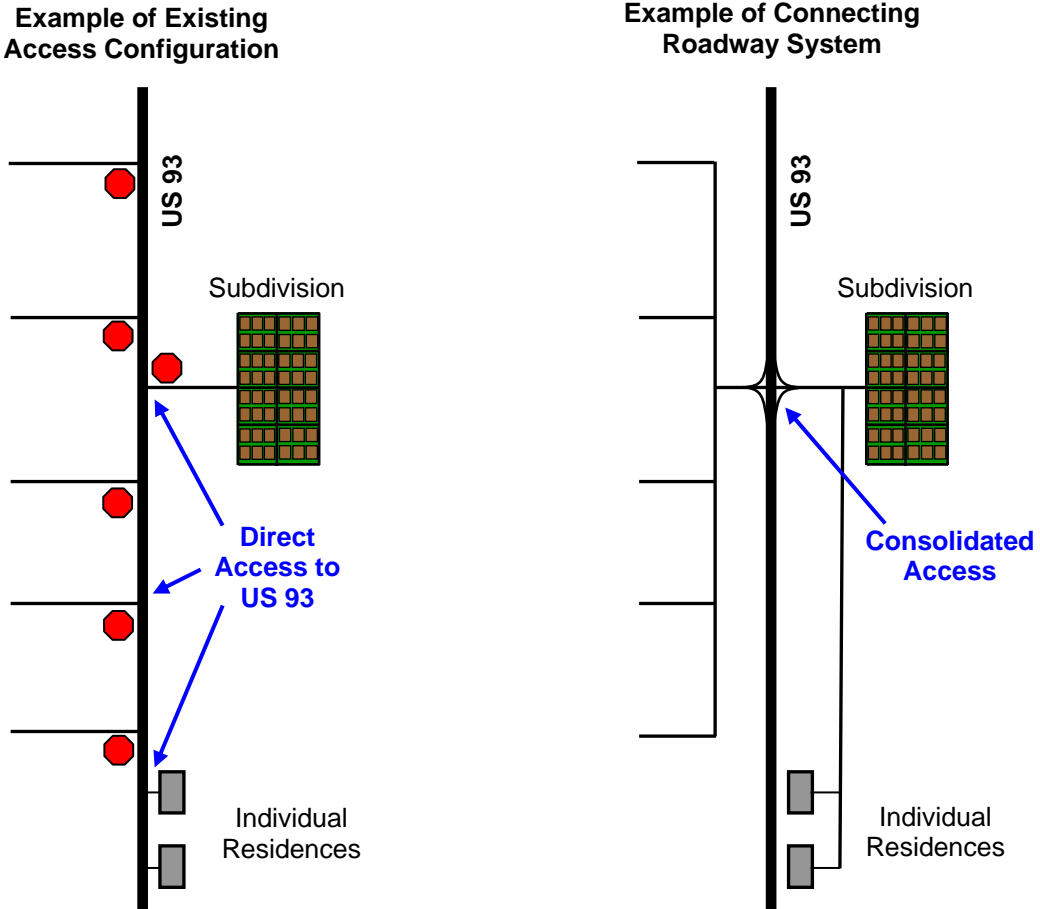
Depiction of Existing Access Configuration and Proposed Connecting Roadway System
